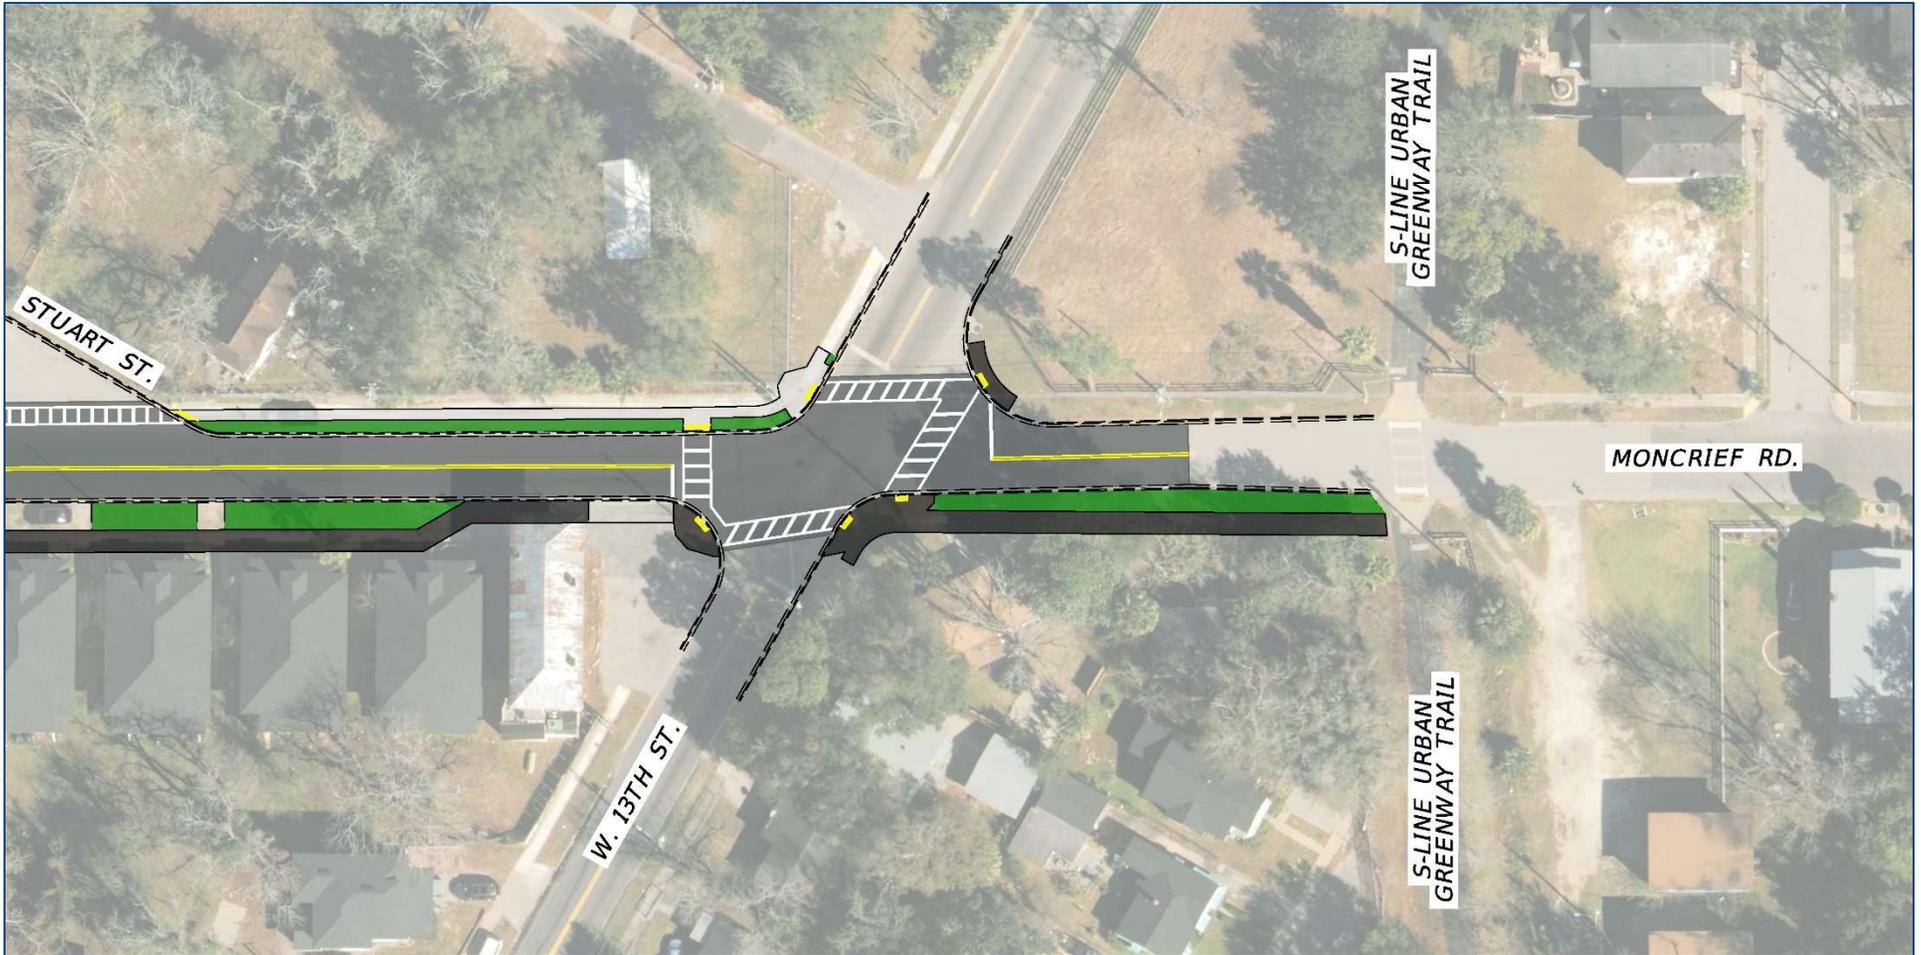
Detail of Concept Roll Plot (S-Line Trail to Stuart Street)
